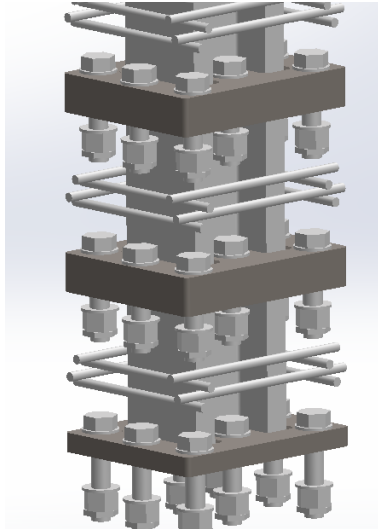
Rebar Reinforcement for Concrete Foundation w/r Beams
